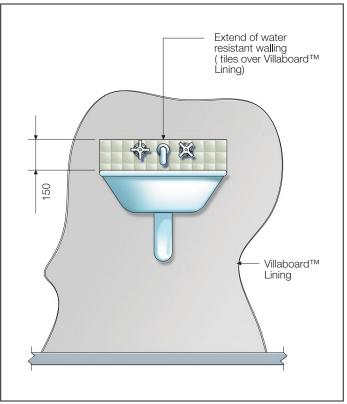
WATERPROOFING VESSELS ABUTTING WALLS
